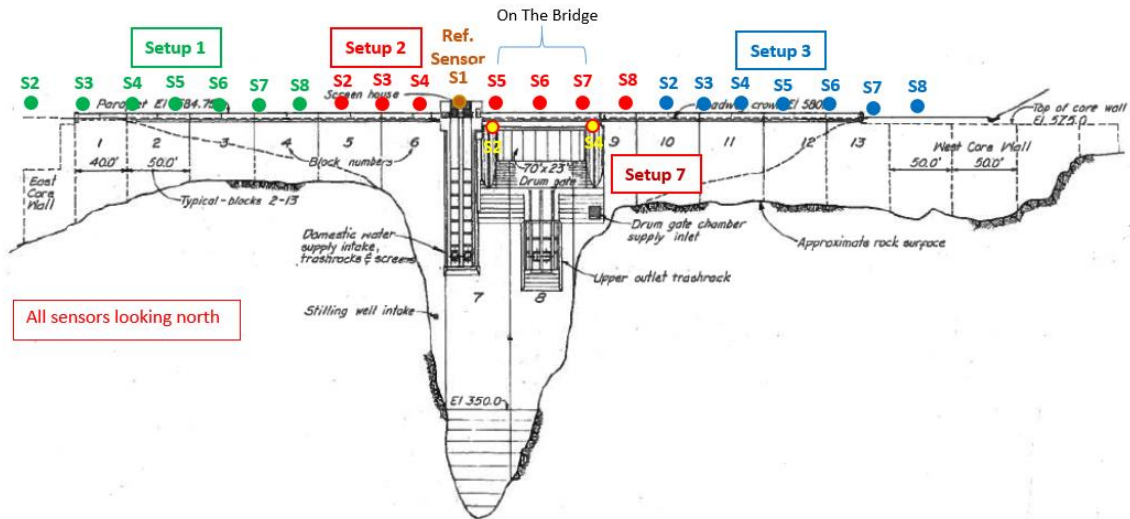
Upstream elevation of the dam and location of measurement setups on the crest (Setup 1, 2, and 3), and location of sensors on the concrete piers (Setup 7).
